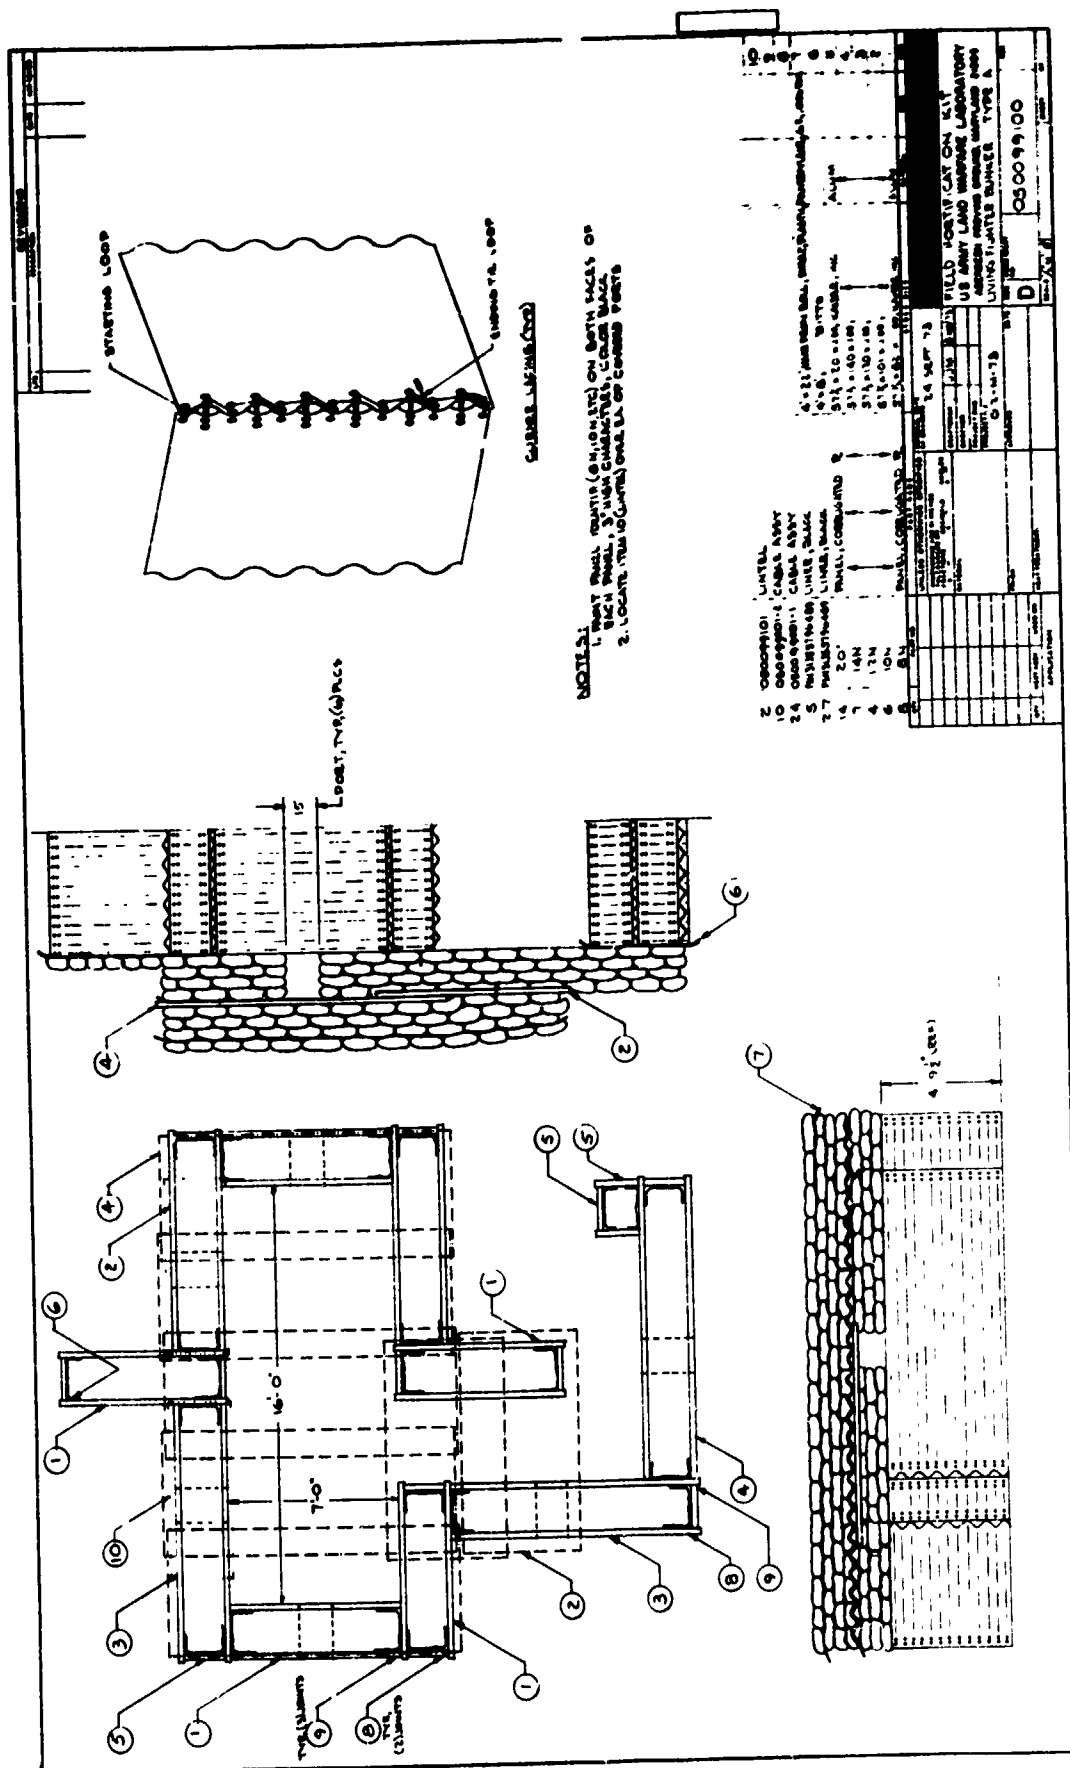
Typical Living/Fighting Bunker, Type "B" After
